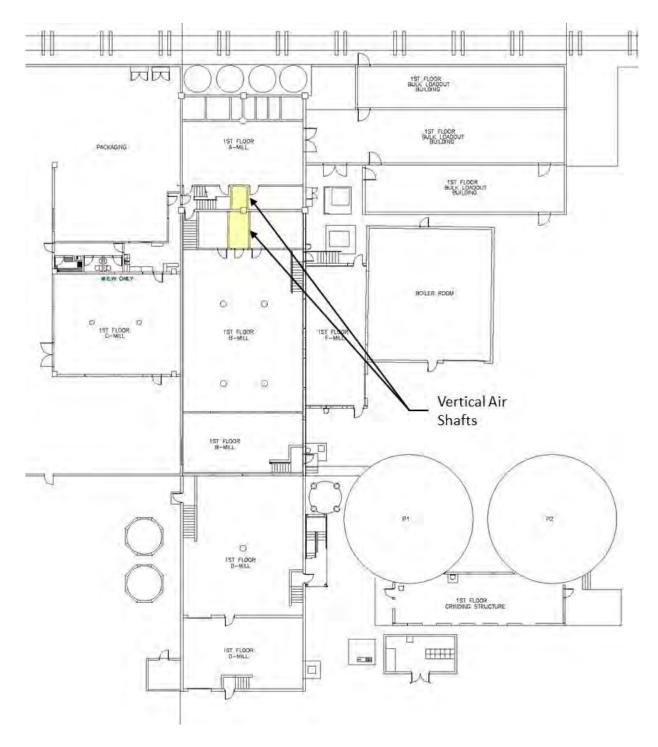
Didion Milling Floor Plan Highlighting Vertical Air Shaft Between Mill A & B
